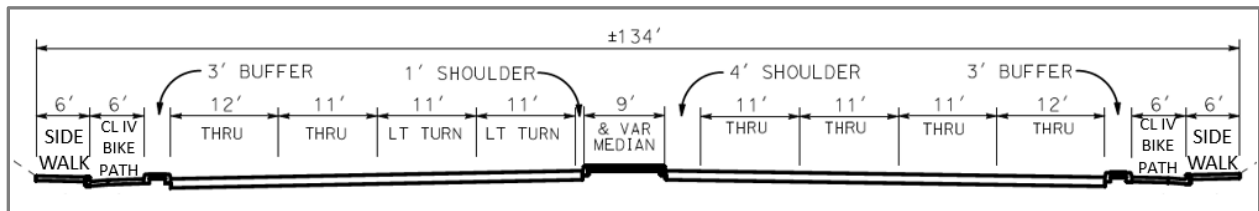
Alternative 1 – Middlefield Road Cross-Section
